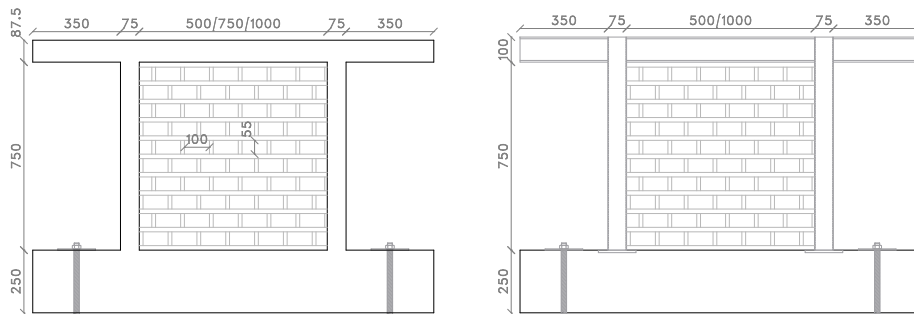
General geometric characteristics of the masonry infilled concrete and steel frame specimens.
